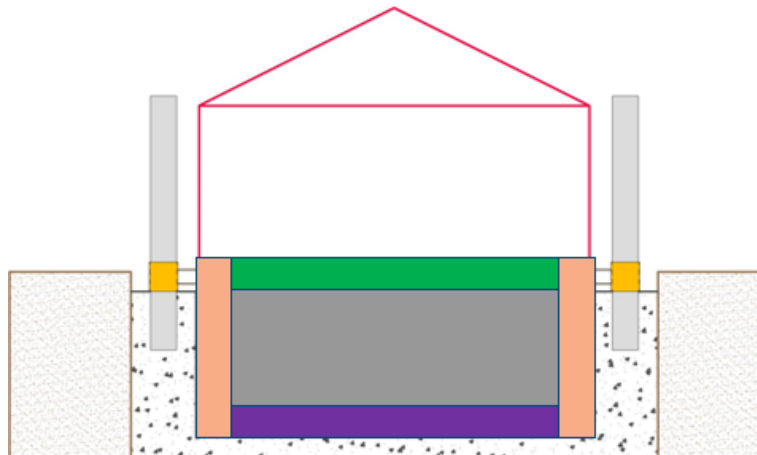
Sections of floating base. Upper Slab (green). Walls (pink). Lower Slab (purple)
